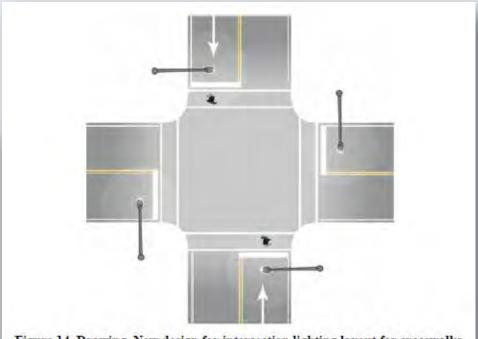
Drawing. New design for intersection lighting layout for crosswalks.
